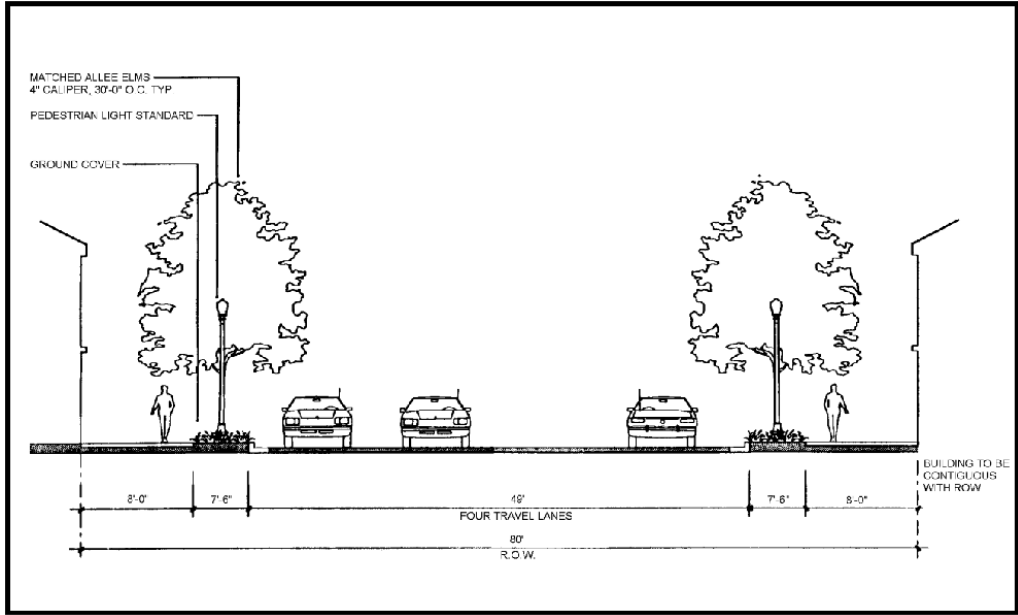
Bear Creek Parkway at Town Center (Undivided Cross Section)
